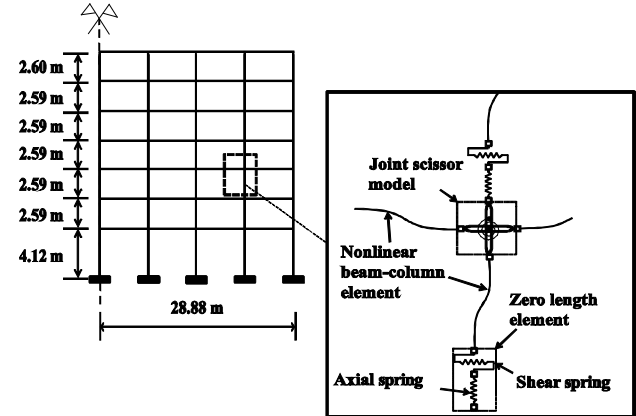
South frame elevation and column, beam and joint models (adapted from (Krawinkler, 2005))
